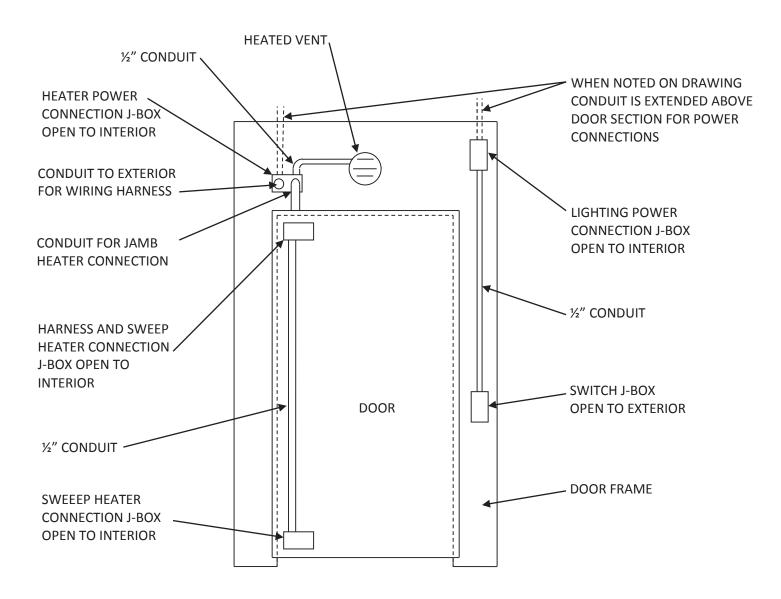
CONDUIT AND J-BOX PLACEMENT 2-POINT CONNECTION
